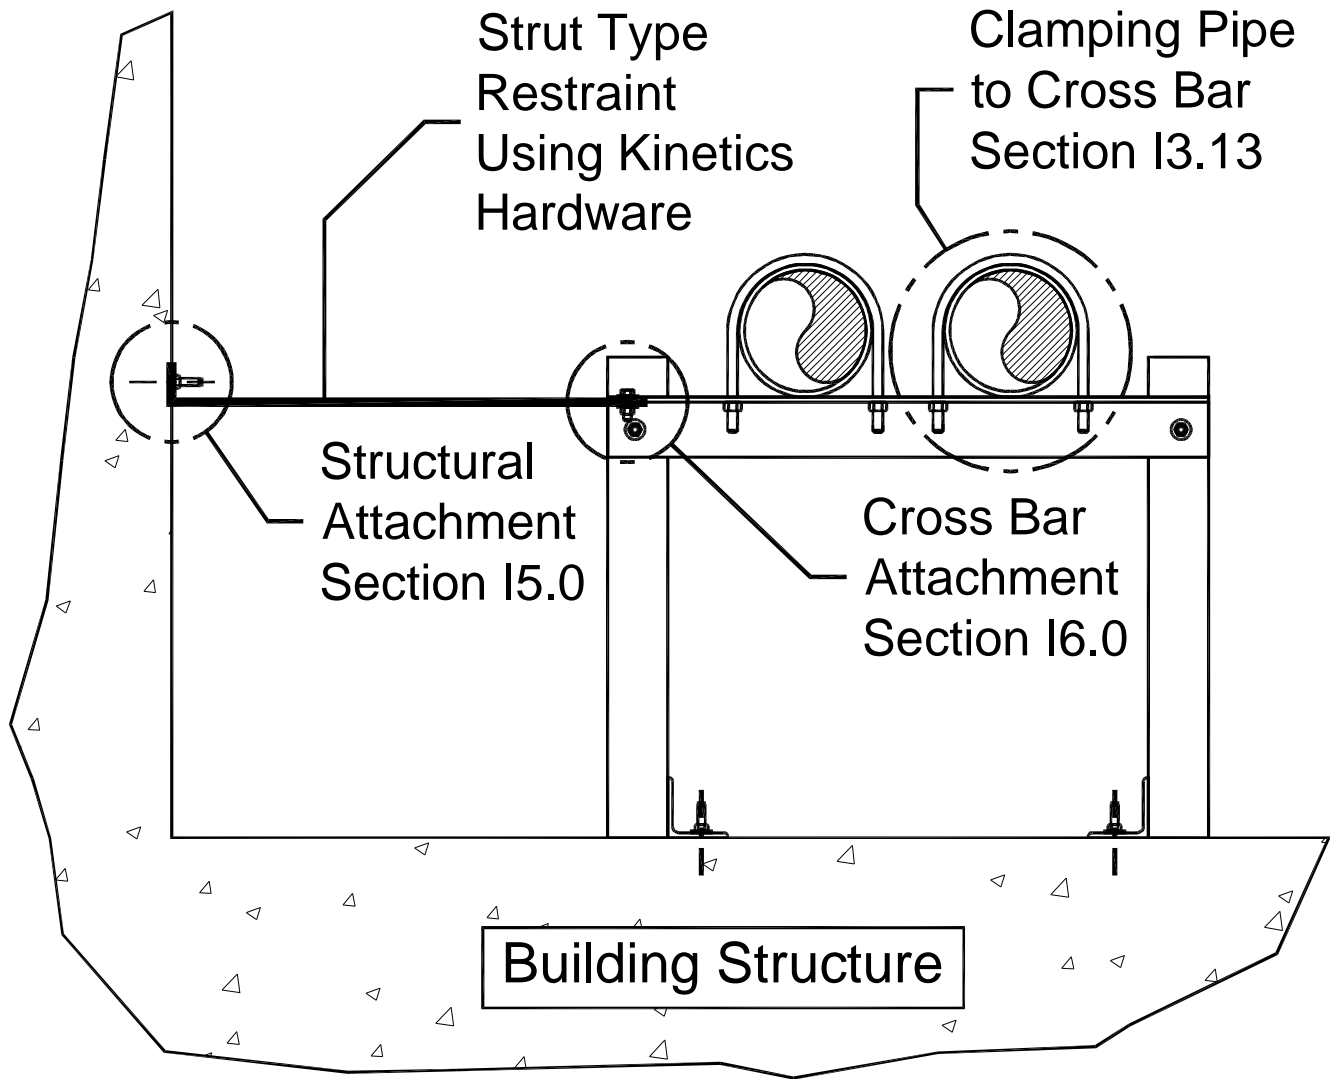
; Transverse (T) Strut Type Restraint Schematic for Floor/Roof Mounted Pipe – Horizontal Strut
